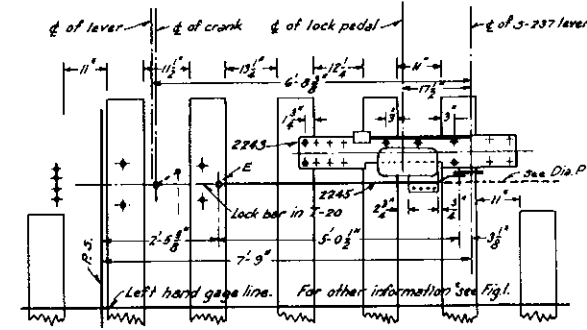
L.H. LAYOUT 30 FT. SWITCH RAIL - 2 HOLE 100 LB. & 130 LB. RAIL.
